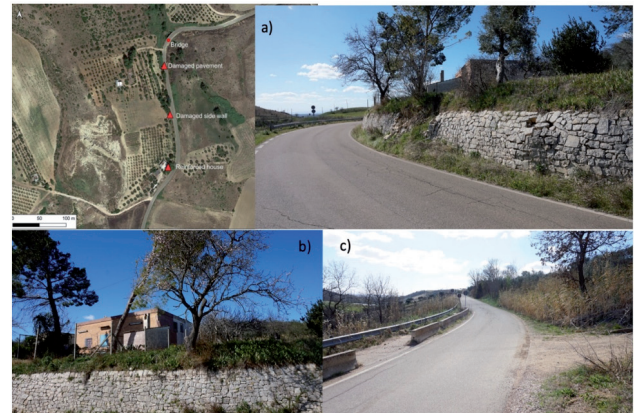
Images of the damages evidencing the displacement of the landslide: a) damages of the side wall; b) reinforcement of the house; c) damages on the road pavement
